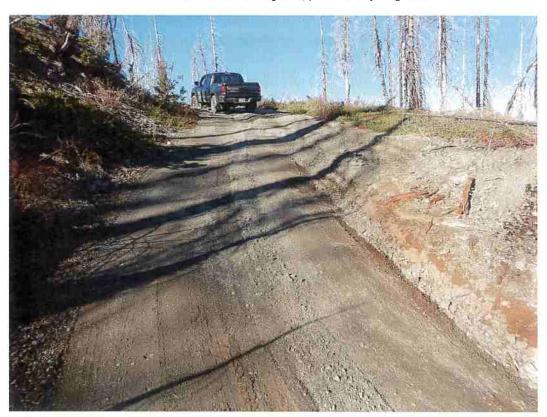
RP 8. Vehicle traveling north, photo taken facing south.
